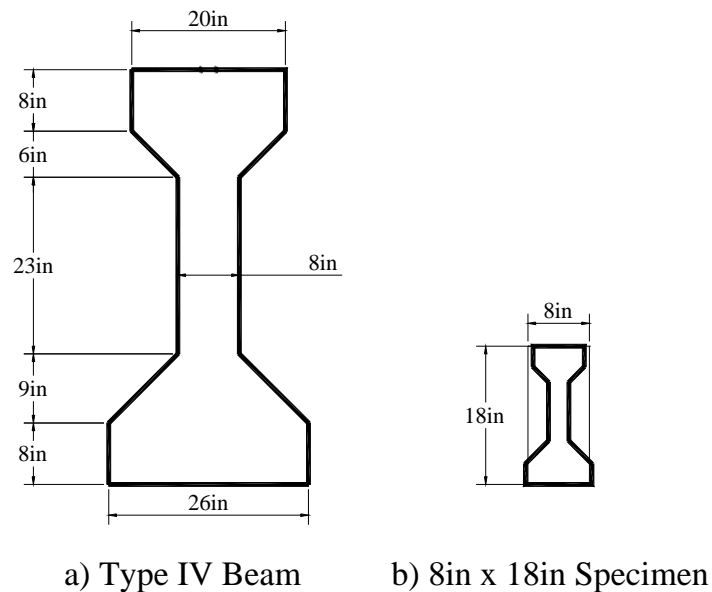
a) Cross-section of TxDOT (AASHTO Type IV) I-girder; b) 1:3 Scaled I-girder and 8in by 18in test specimen (Castro, 2003)
